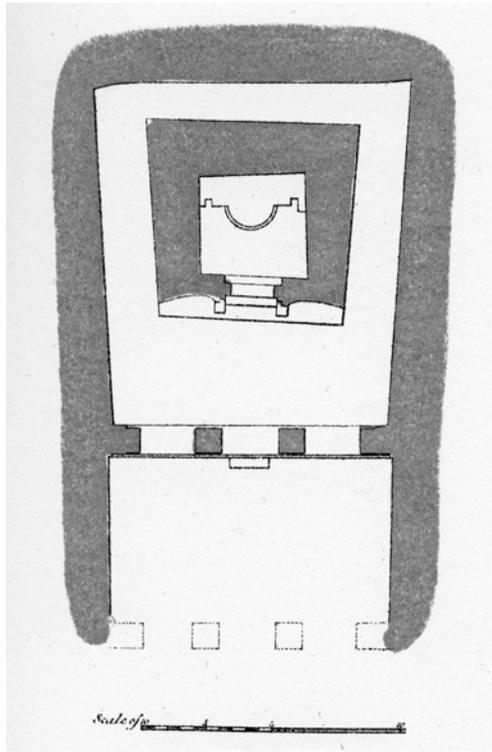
Aurangabad cave no. 2, plan (Burgess 1878).
